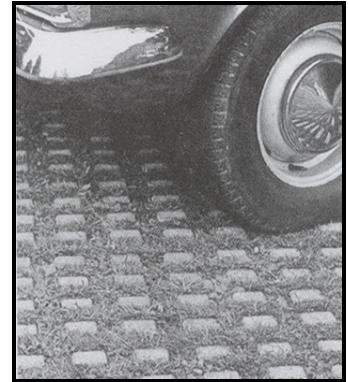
Modular pavement (Source: NYSDEC, "Reducing the Impacts of Stormwater Runoff From New Development", 1993).
